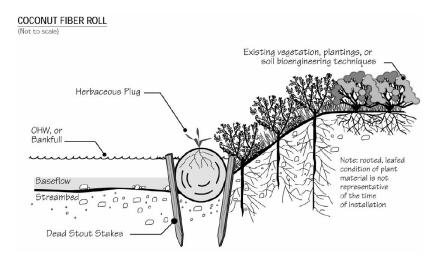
Cross section of an embankment showing a coconut fiber roll, sometimes called choir log, at the toe of an embankment, held in place with stakes, and live planting. USEPA 2007.
